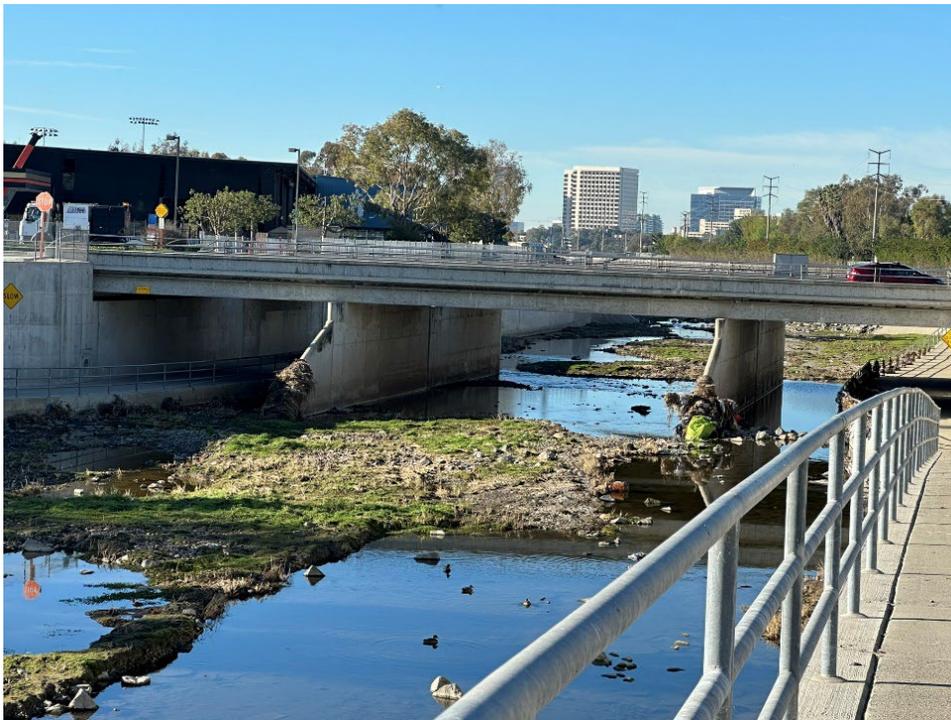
Barranca Parkway bridge over the Peters Canyon Channel. View facing southwest.
